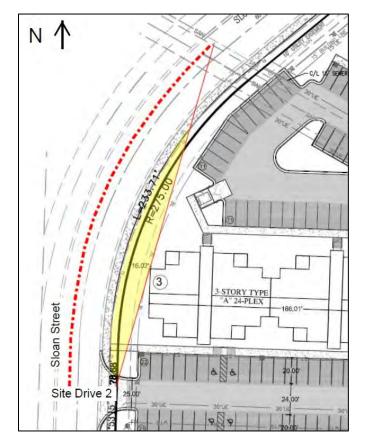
Driver's Line of Sight Looking North from Site Drive 2
